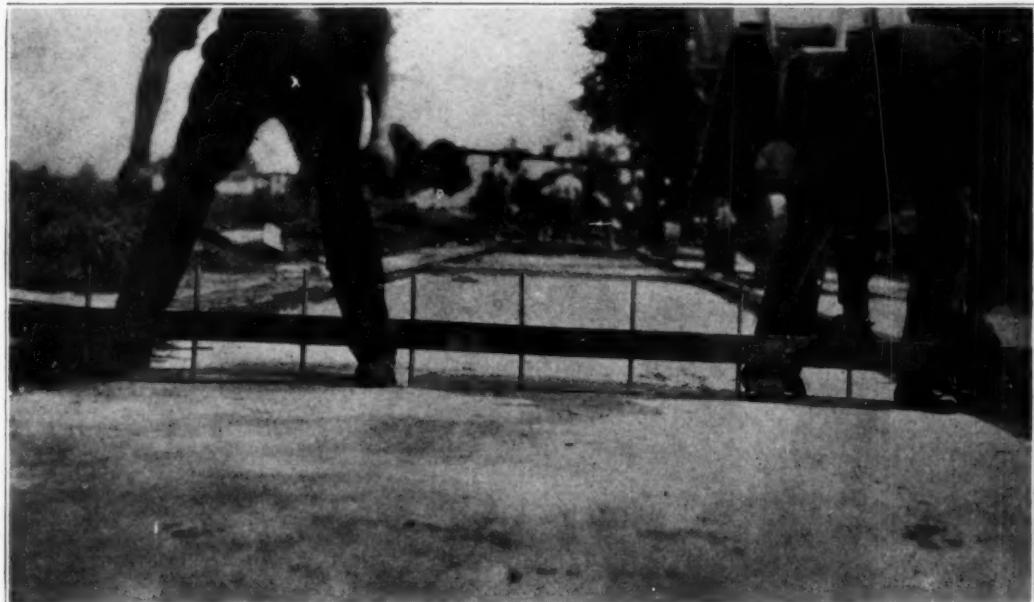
Template Used So That Joint Material Could Be Made to Fit Surface
